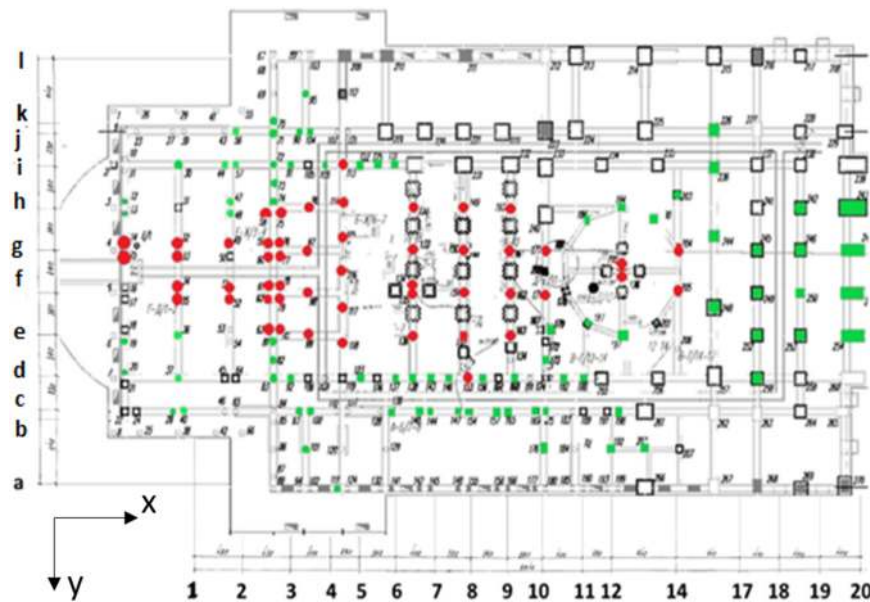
The layout of the piles. Bad piles' fixity is shown in red, and good piles' fixity piles are in green.
